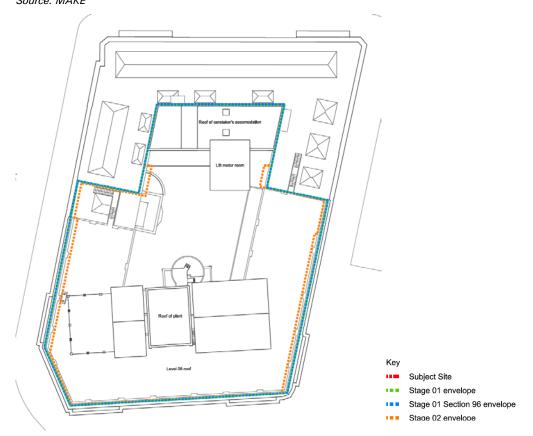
Education Building Plan Concept Envelope Assessment *Source: MAKE Architecture
